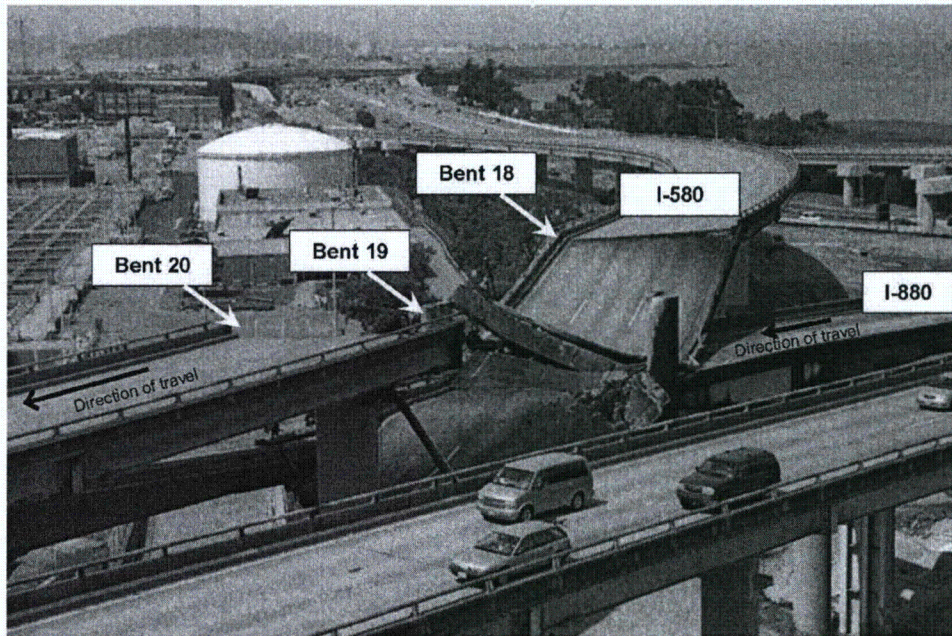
Post-fire aerial view of the collapsed section of I-580 looking west. Picture from Caltrans <http://www.dot.ca.gov/dist4/photography/images/070429>.
